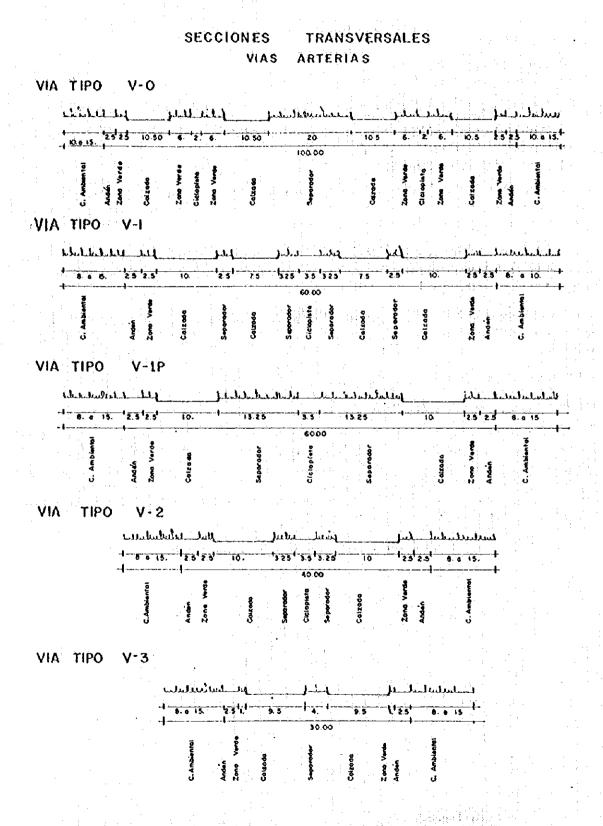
Typical Cross Section on Existing Arterial Road
